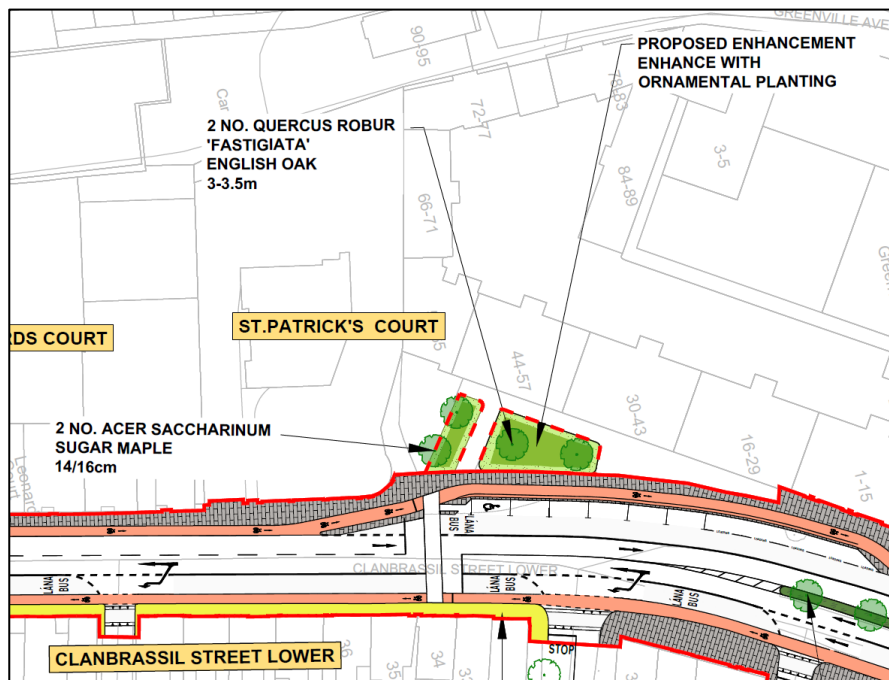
Proposed Landscaping improvement at St. Patrick's Court
